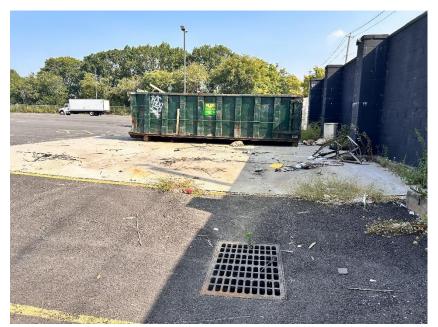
Storm drain and waste storage containers in the eastern part of the site (facing north).
